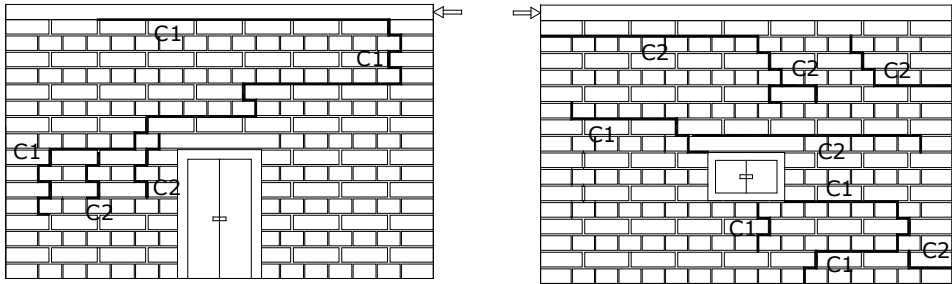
Model of masonry type A (HM-1) after testing under static load
